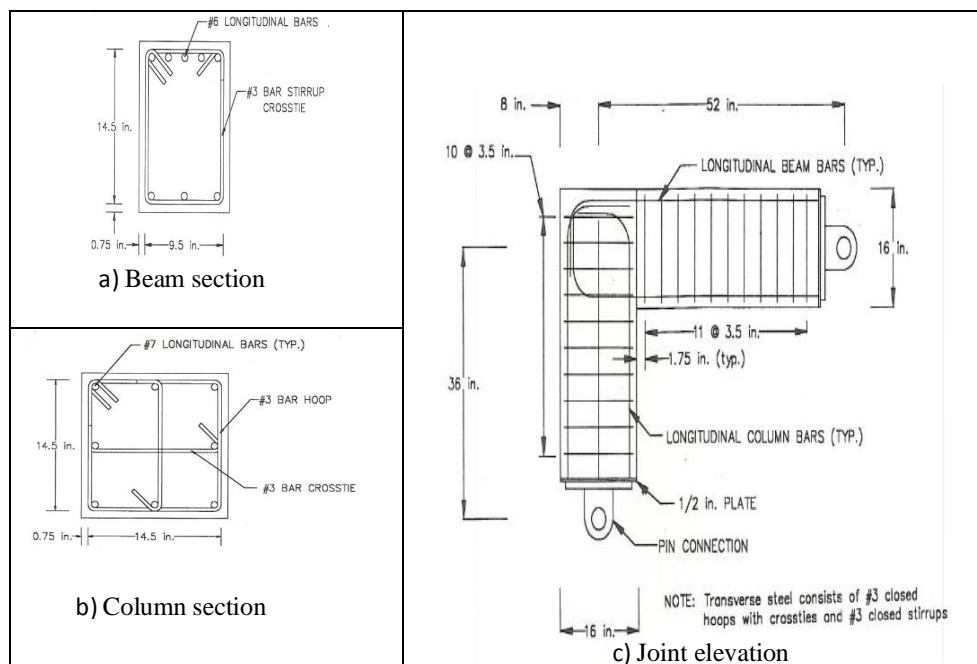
Dimension and details of knee joint [8] (all dimension in inch).
